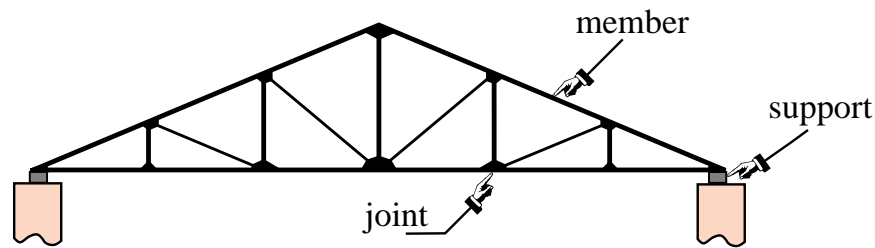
An actual plane truss structure. That shown is typical of a roof truss used in residential building construction.
